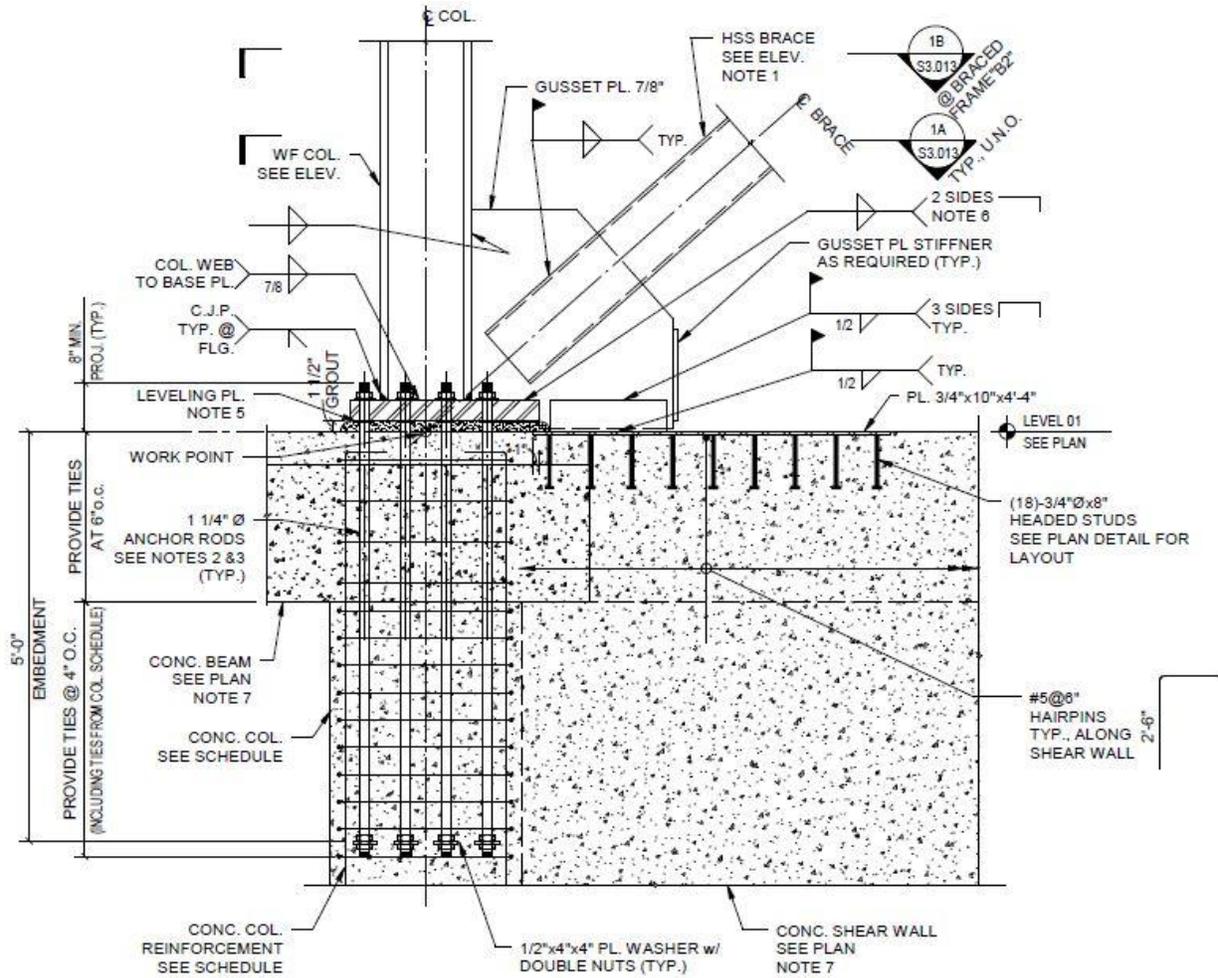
Typical Braced Frame to Shear Wall Connection (Construction Documents)
